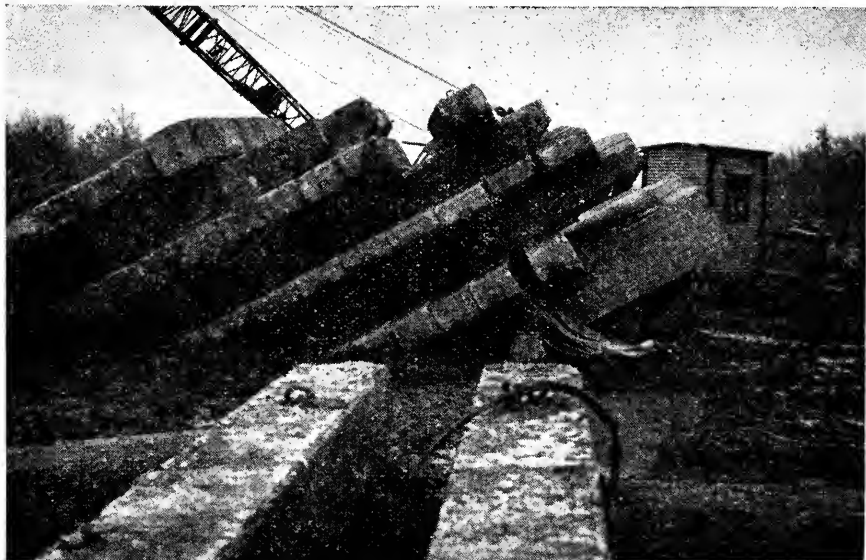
Failure of timber piles at Two O'Clock Bayou.
